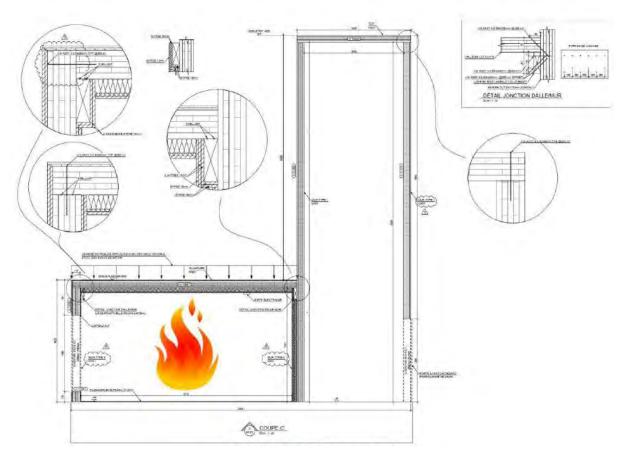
Vertical cross section of apartment and stair/elevator shaft, from Su and Muradori (2015)
